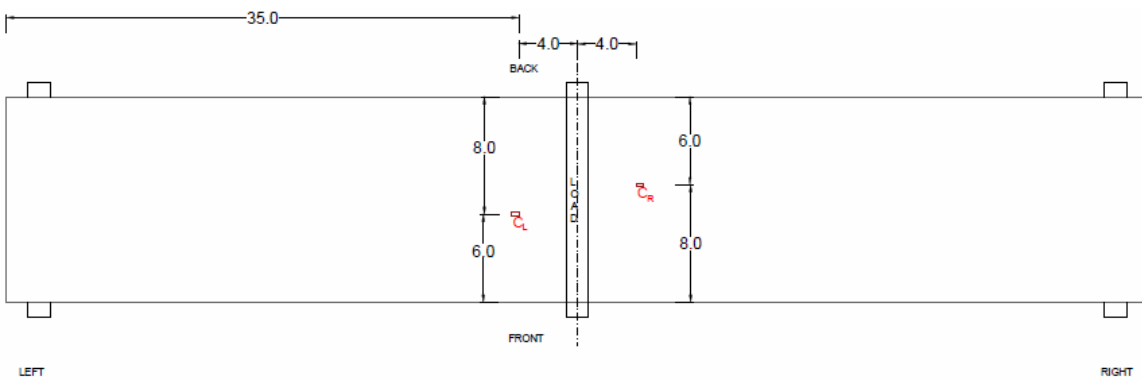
Concrete strain gauges' position on all slabs (top surface)
